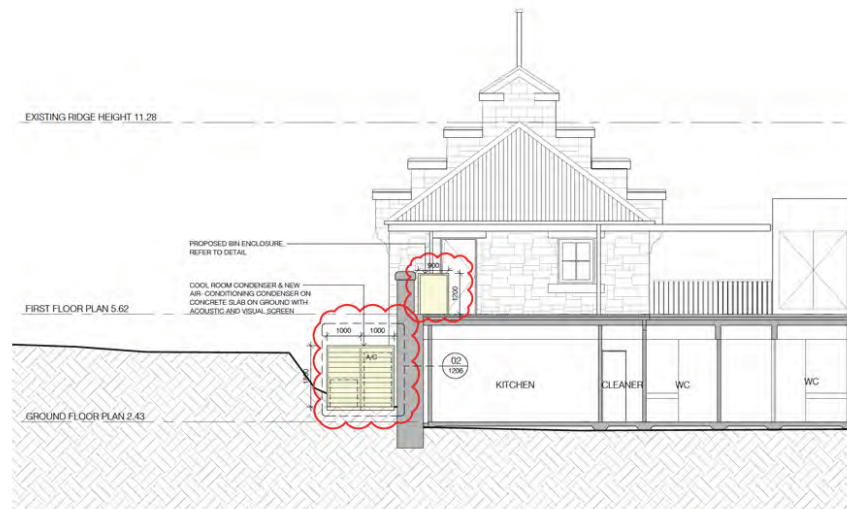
Extract of BJB Architects proposal plans, West elevation showing the proposed air conditioning condenser with acoustic and visual screen located to the north of the building. The proposed bin enclosure is located behind the existing sandstone wall and will not be visible when approaching the site from the north.
